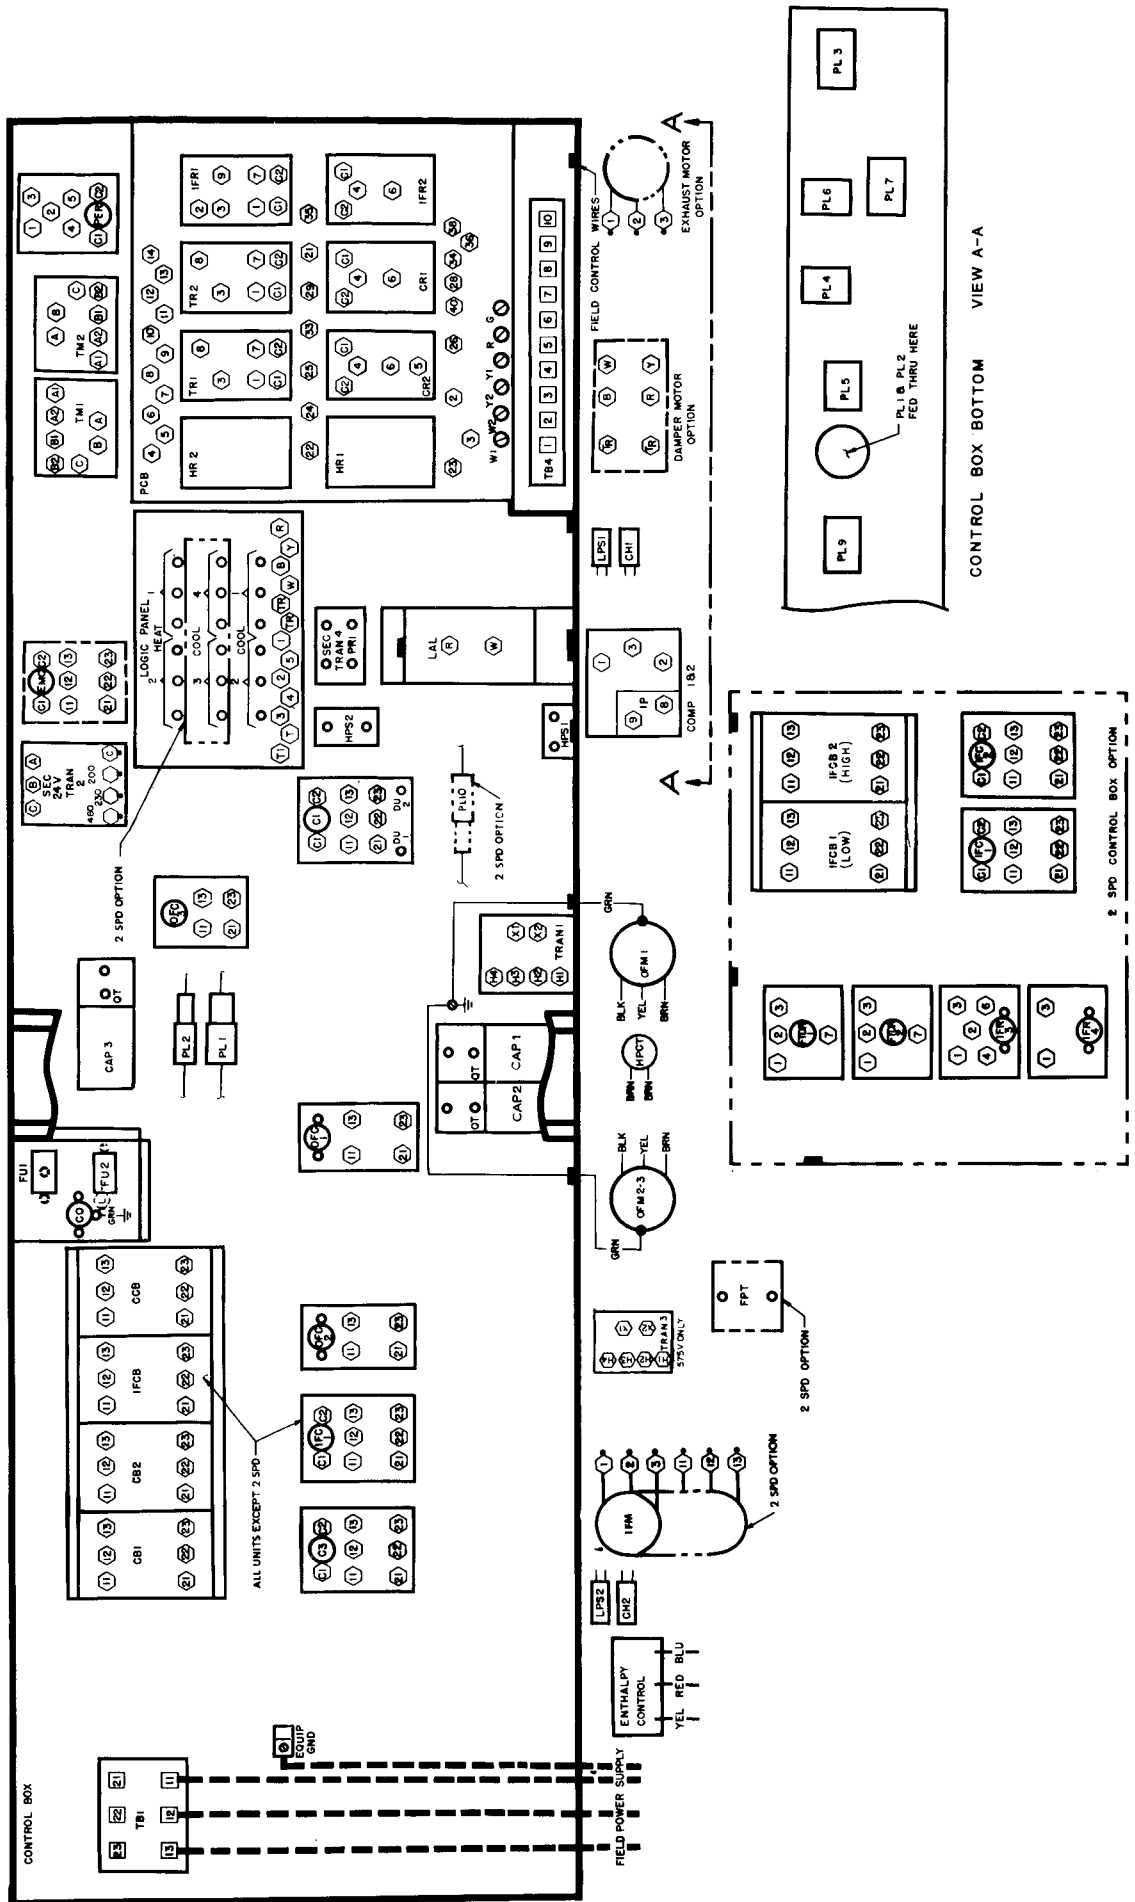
Component Arrangement; 50DF034; 460, 575-3-60
